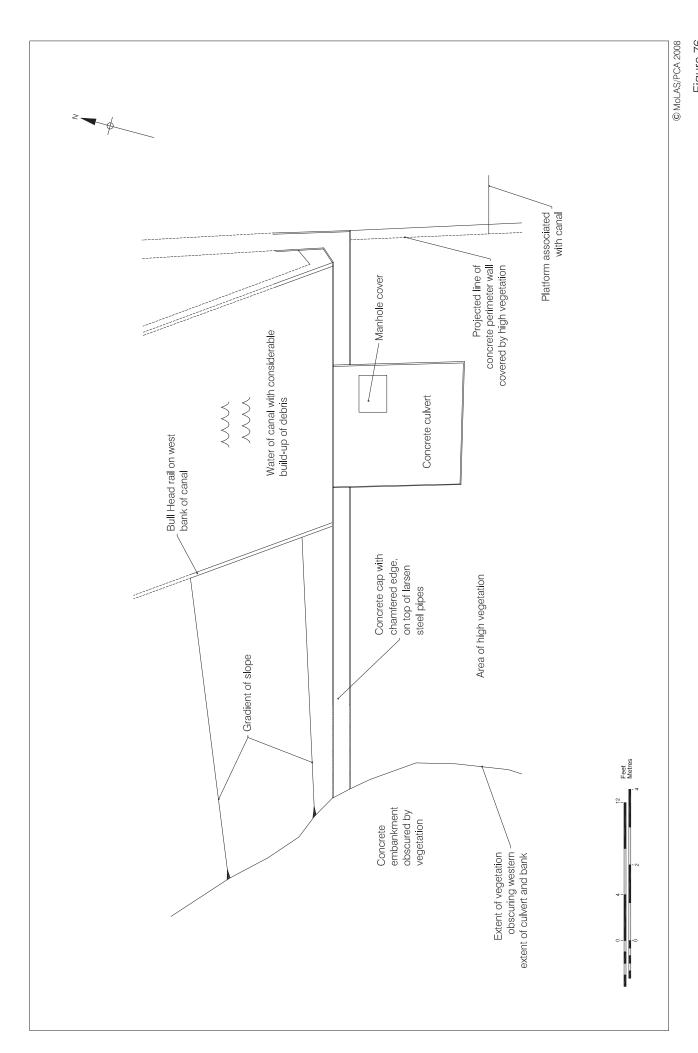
Plan of culverted south-east extent of Pudding Mill River: OL-01207 1:100 at A4
